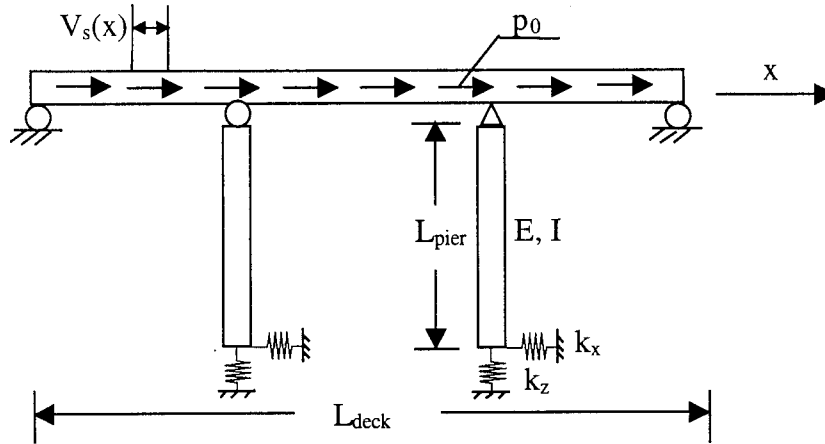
Bridge A-237R Subjected to an Assumed Longitudinal Loading
